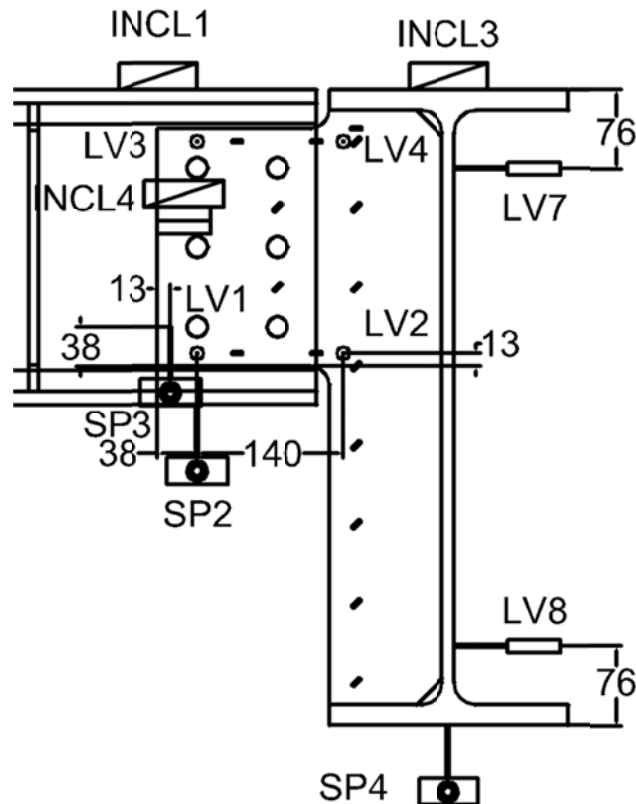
Out of Plane LVDT Layout, Configuration 5
